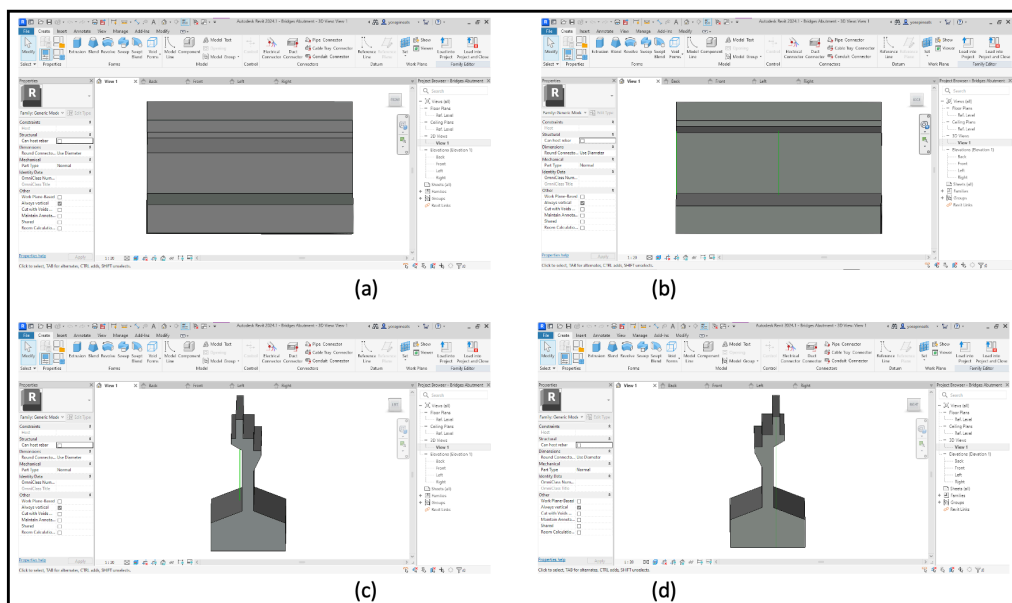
Front elevations (a) Back elevations (b) Left elevations (c) Right elevations (d)
